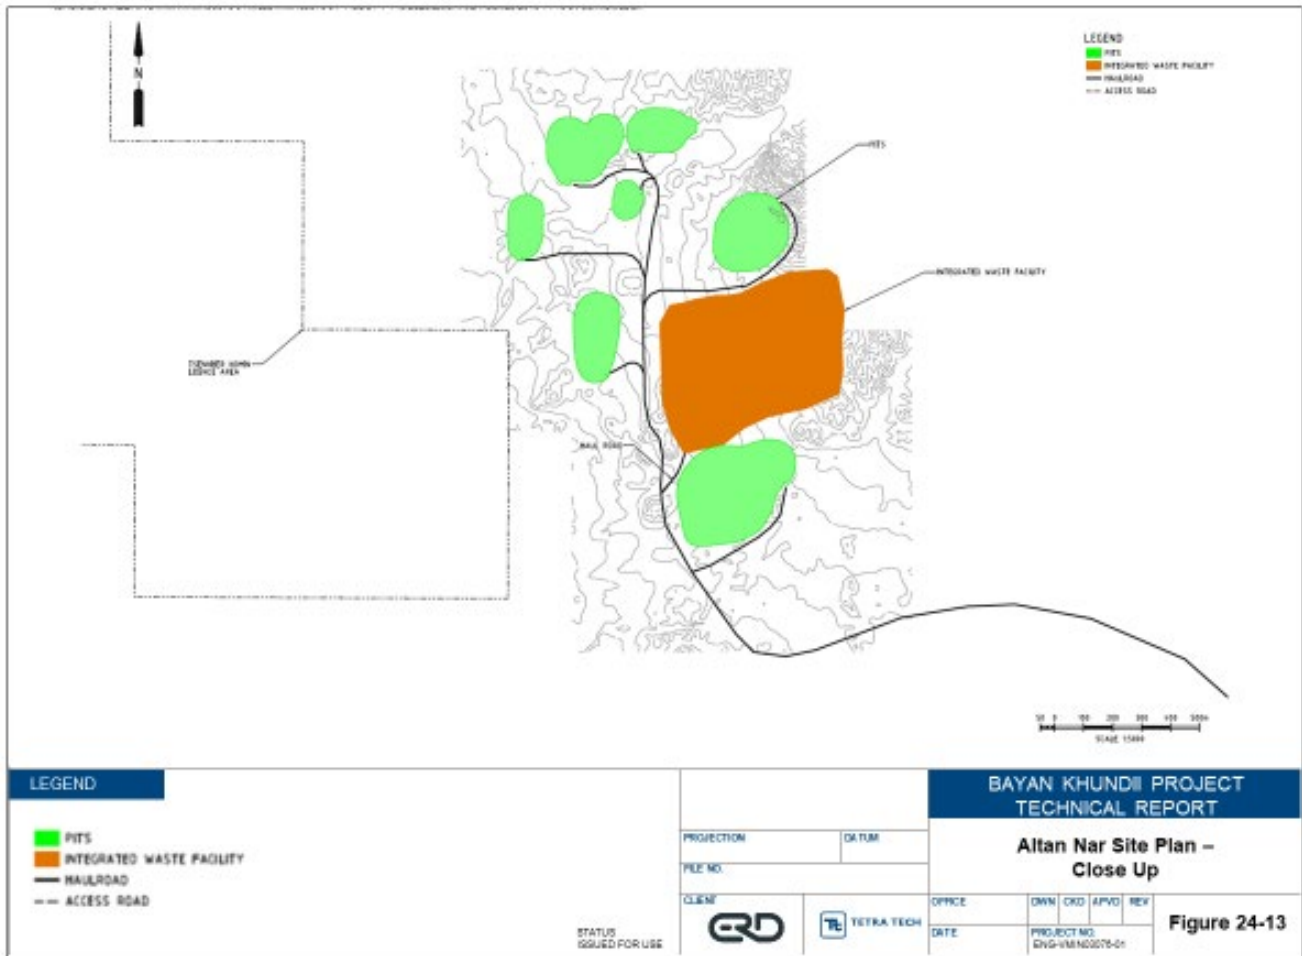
Altan Nar Site Plan – Close Up (Extract from Tetra Tech Drawing No. 226093-DM-006)
